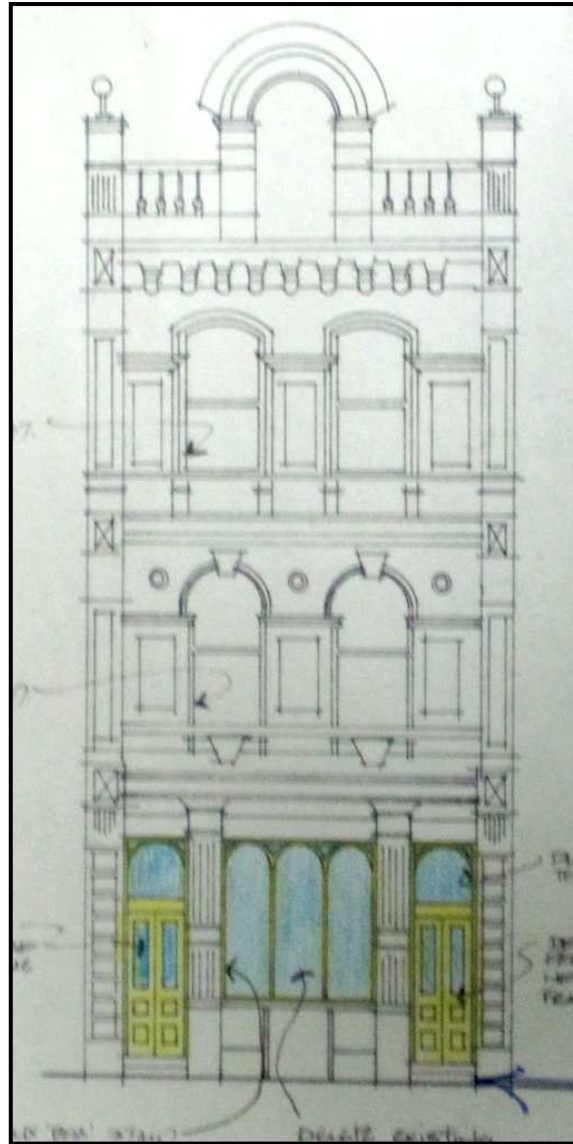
proposed façade restoration works in 1987 (MCC BA62970)
